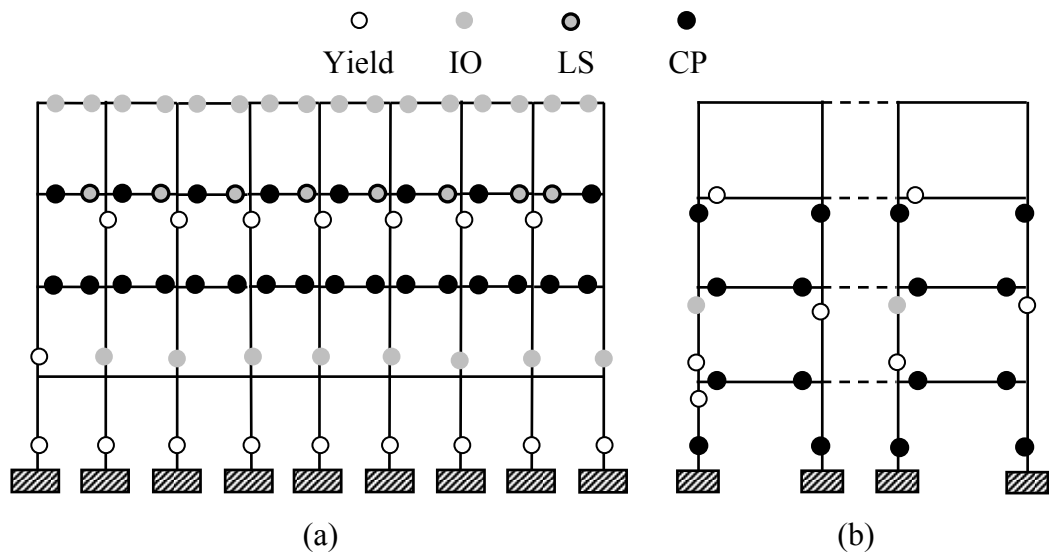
Collapse mechanism of four storey RC bare frame building, designed as SMRF as per relevant Indian Standards: (a) typical longitudinal frame; (b) typical transverse frame.
